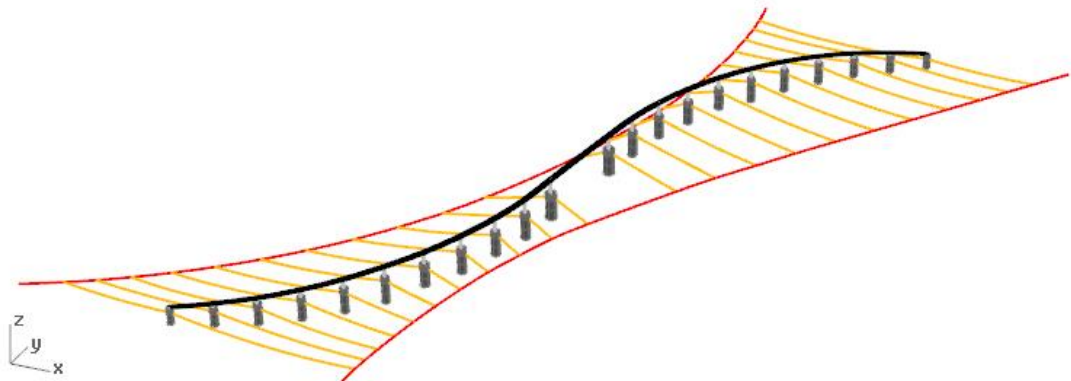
3D PERSPECTIVE ANCHORING SYSTEM
